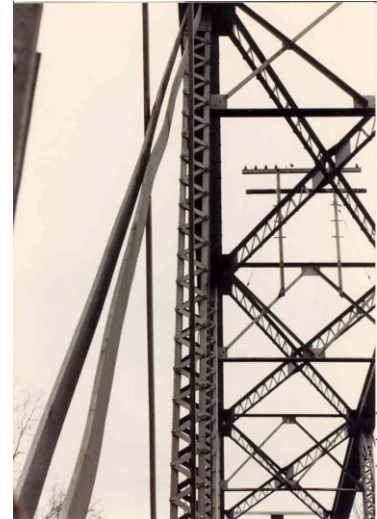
Pratt Truss – loose diagonal eyebars
